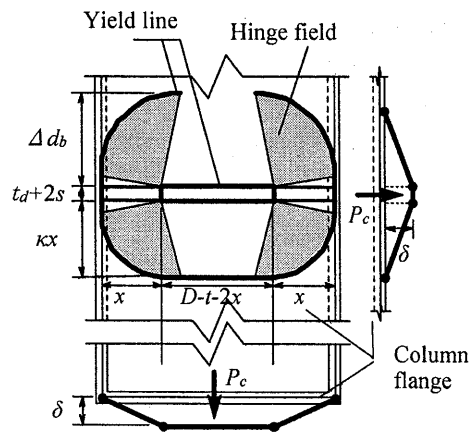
Out of plane collapse mechanism of column tubular wall for mechanism P_B
